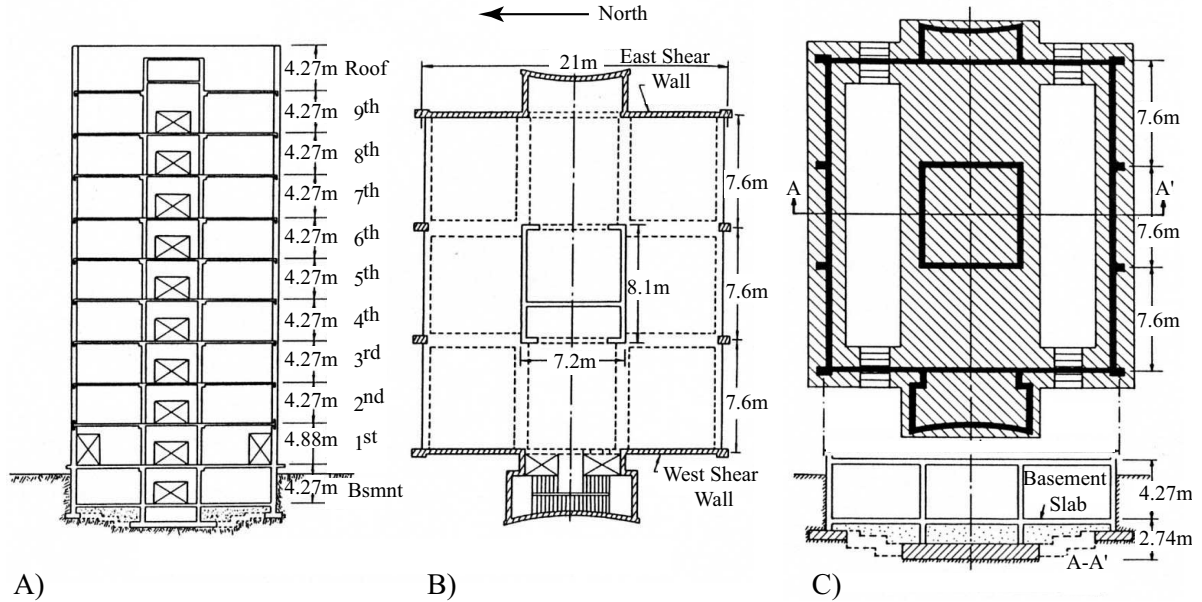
The Millikan Library (Favela, 2004): A) North-South cross section, B) Floor plan, C) Plan view and cross section of the foundation
